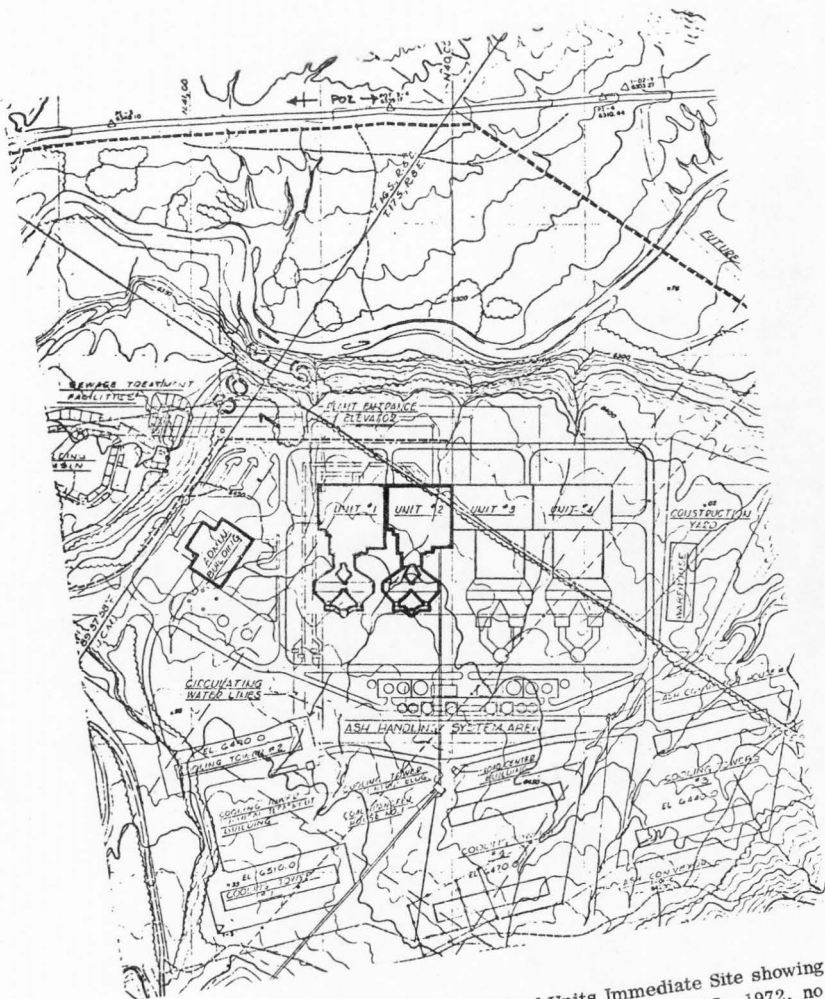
Detailed Site Plan and TOPO of Units Immediate Site showing Unit 2, Administration, and POZ on road. (UP&L, 1972, no. p.)
